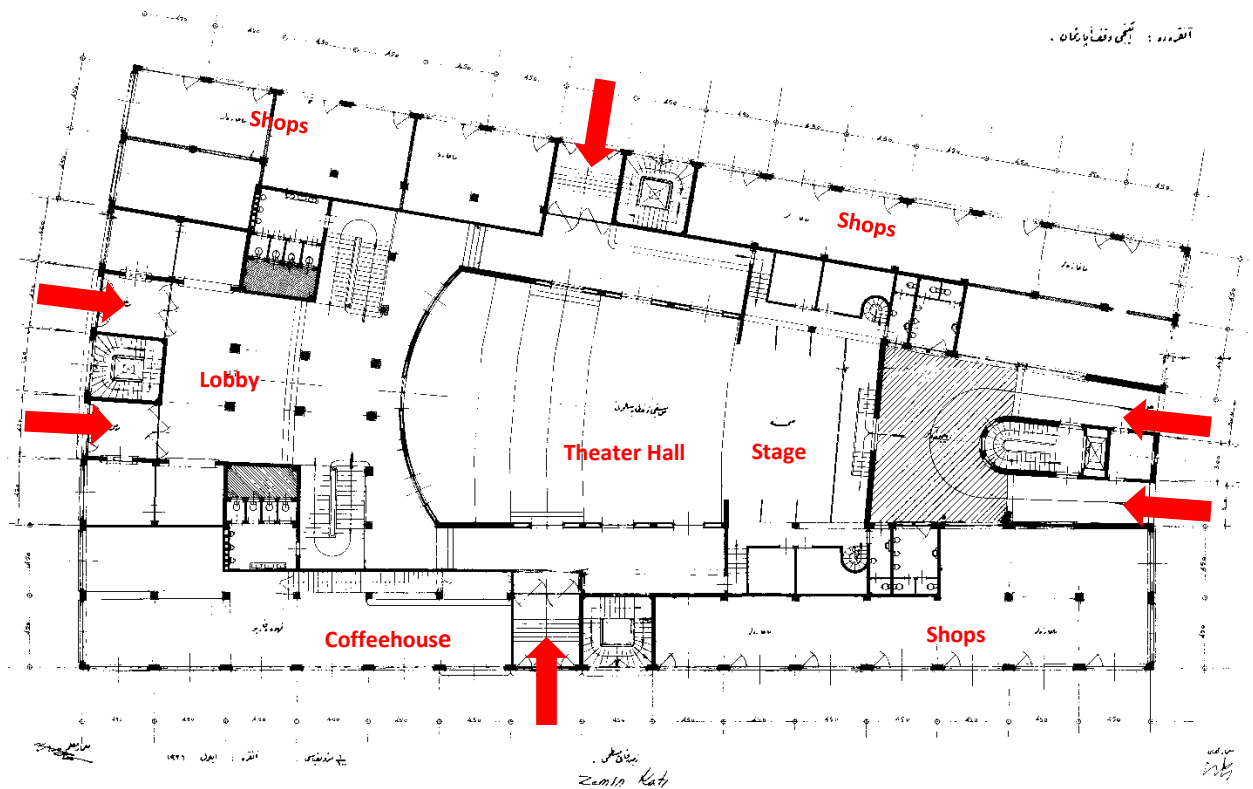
İkinci Vakıf Apartmanı Building Ground Floor Plan [20].
